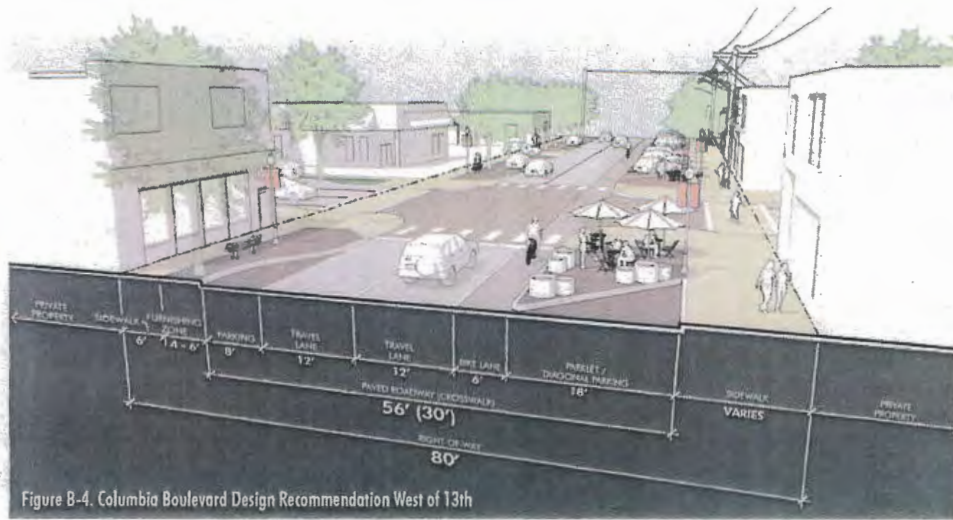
Columbia Boulevard Design Recommendation West of 13th
